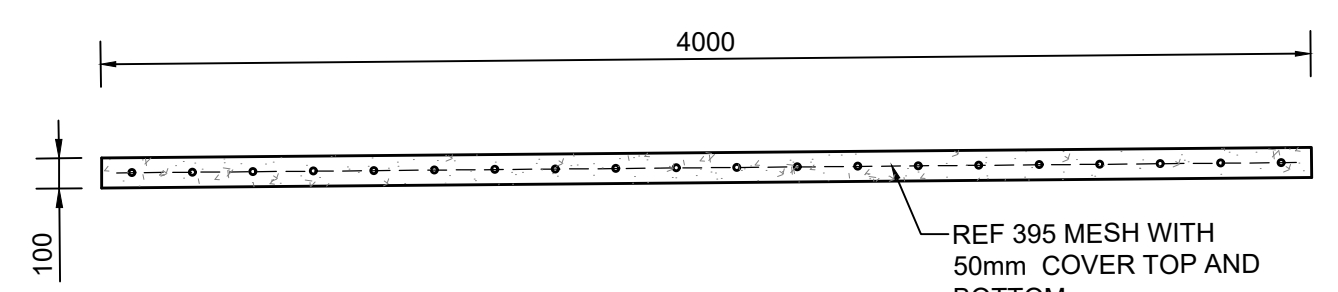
DETAIL OF CONCRETE LINER, PONDS 2 TO 4
